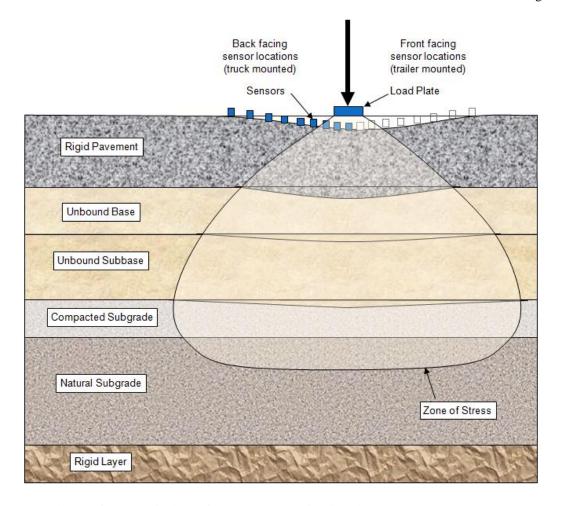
Depiction of FWD Load Distribution Through Pavement
